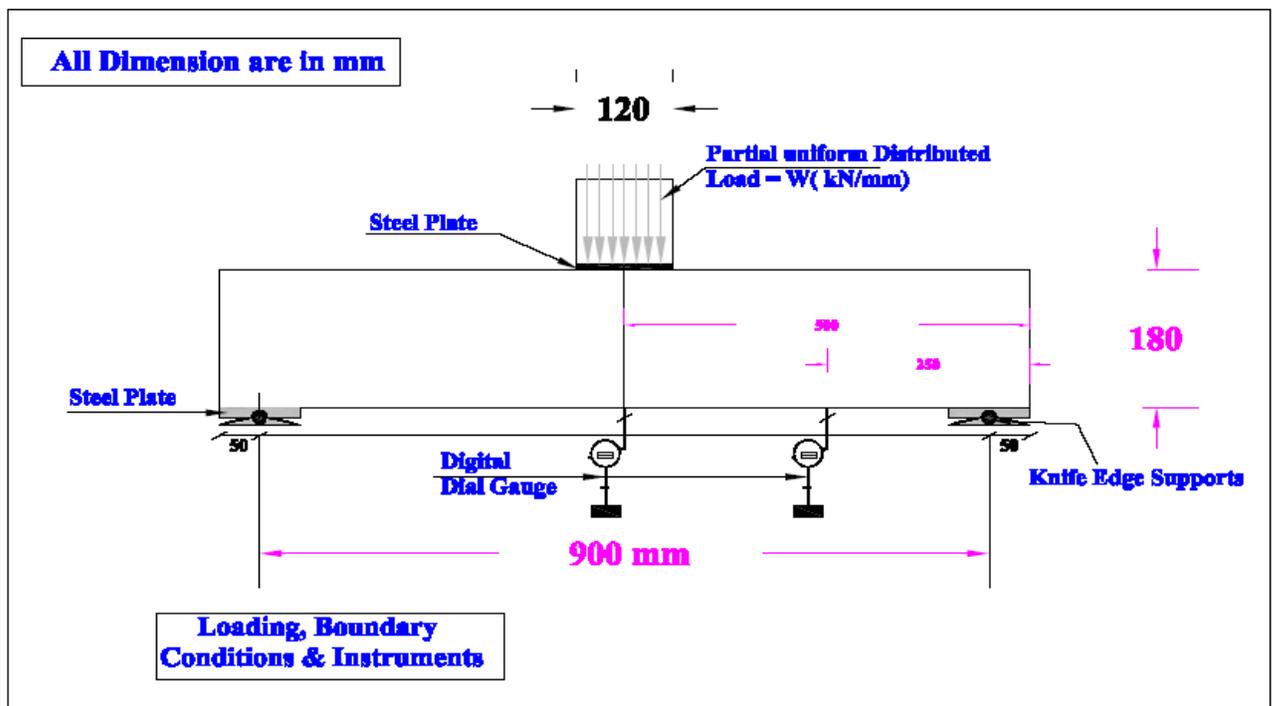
Arrangement specimens of partial uniformly distributed loading and instrumentation.
